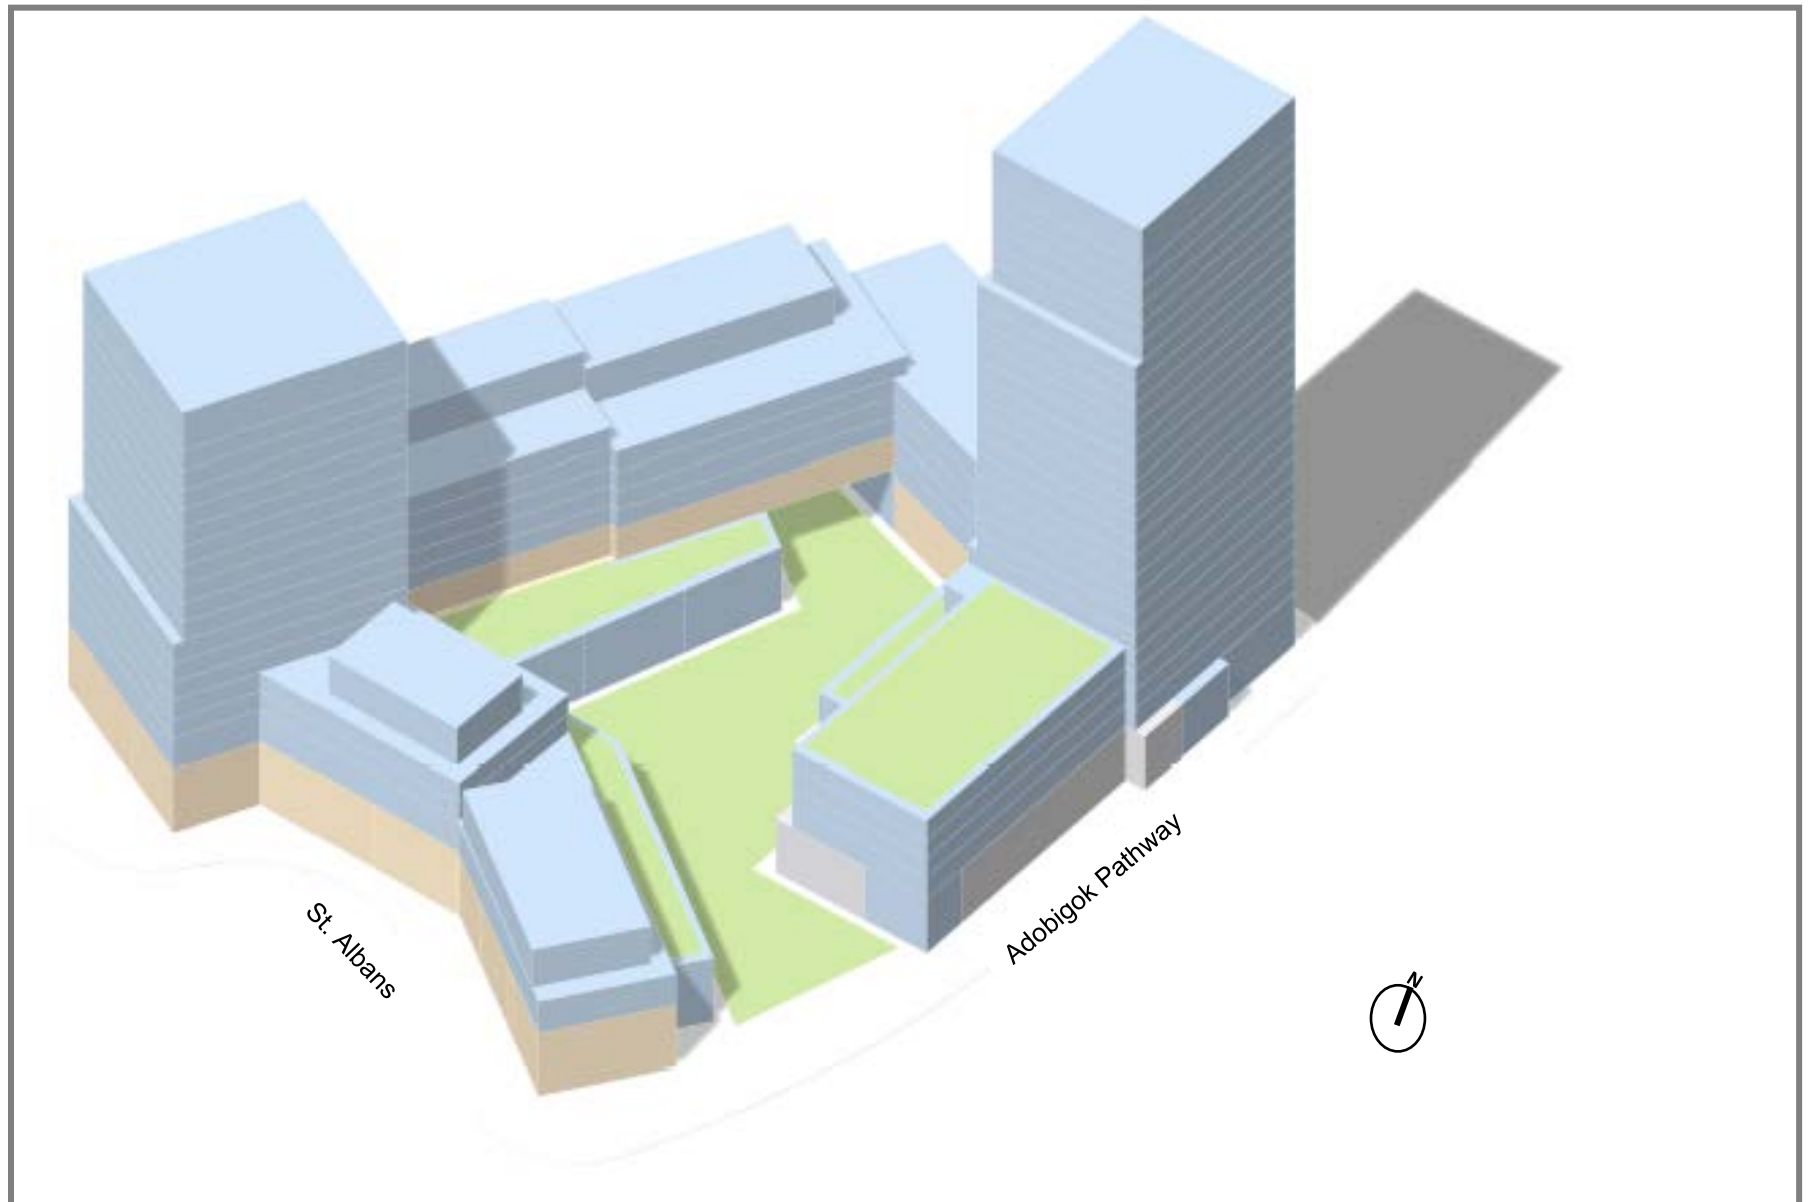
Bloor-Kipling (Six Points) - Block 1 Built Form
